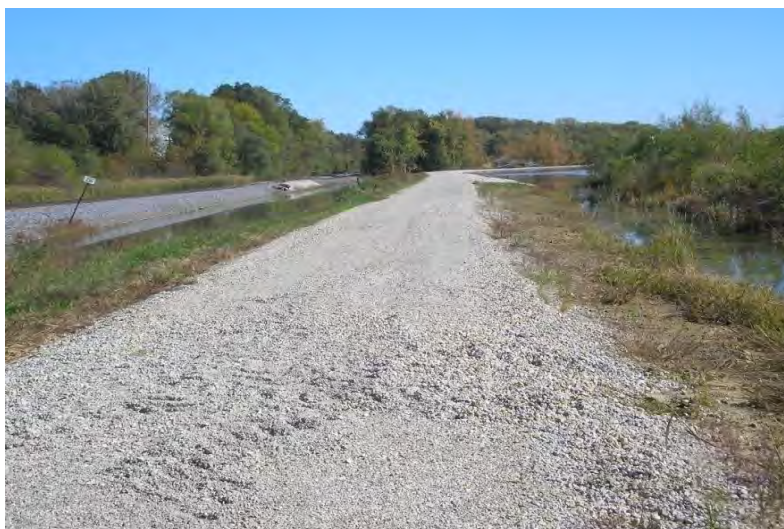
Ash Pond 1 Crest at Southwest End
